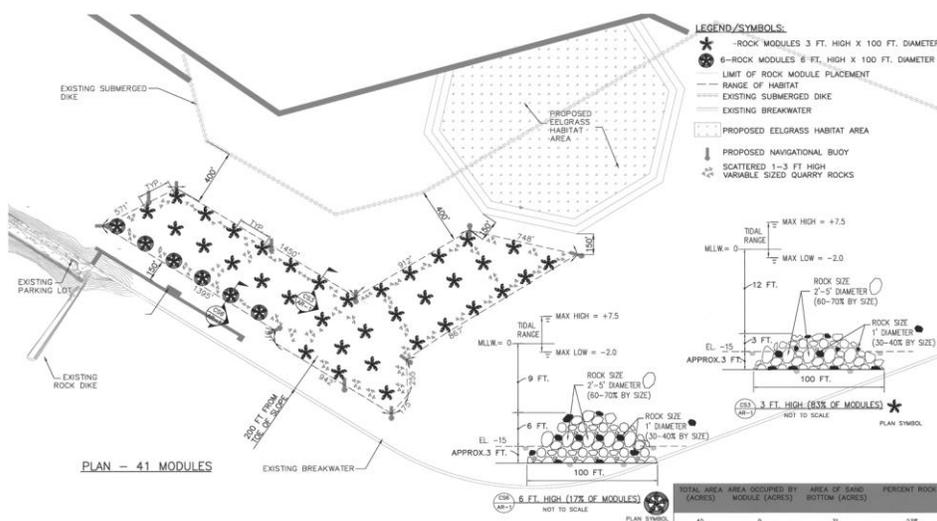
Conceptual reef design for the Cabrillo Pier Alternative
